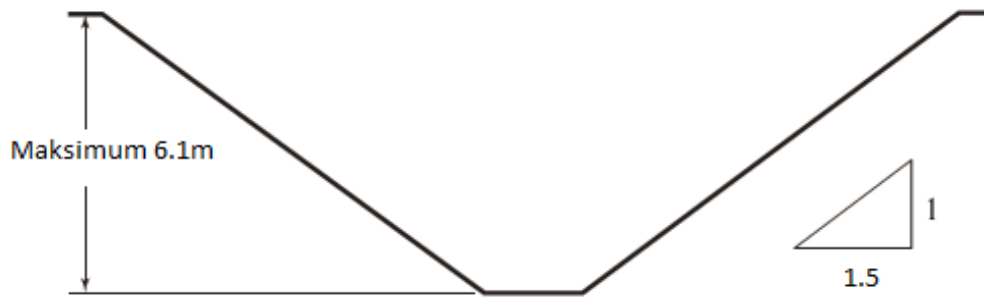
Excavations in soil type C (Yavaş, 2016)
